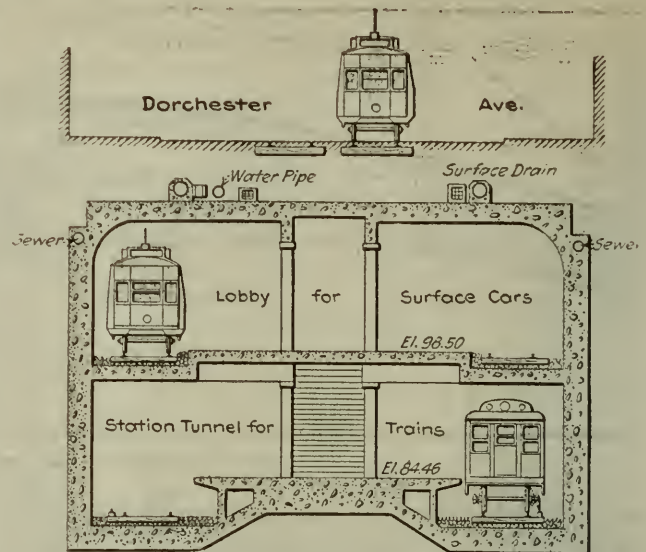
SECTION OF DORCHESTER TUNNEL, BOSTON
